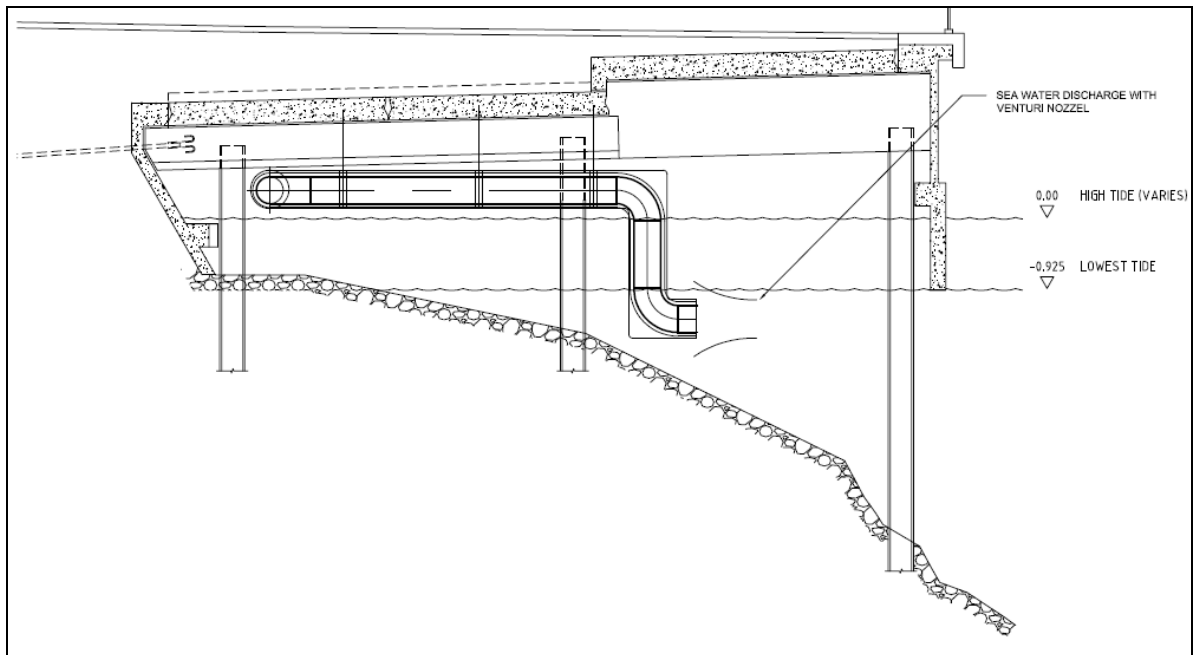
Seawater Discharge – Cross Sectional View, Drawing M1007-A
